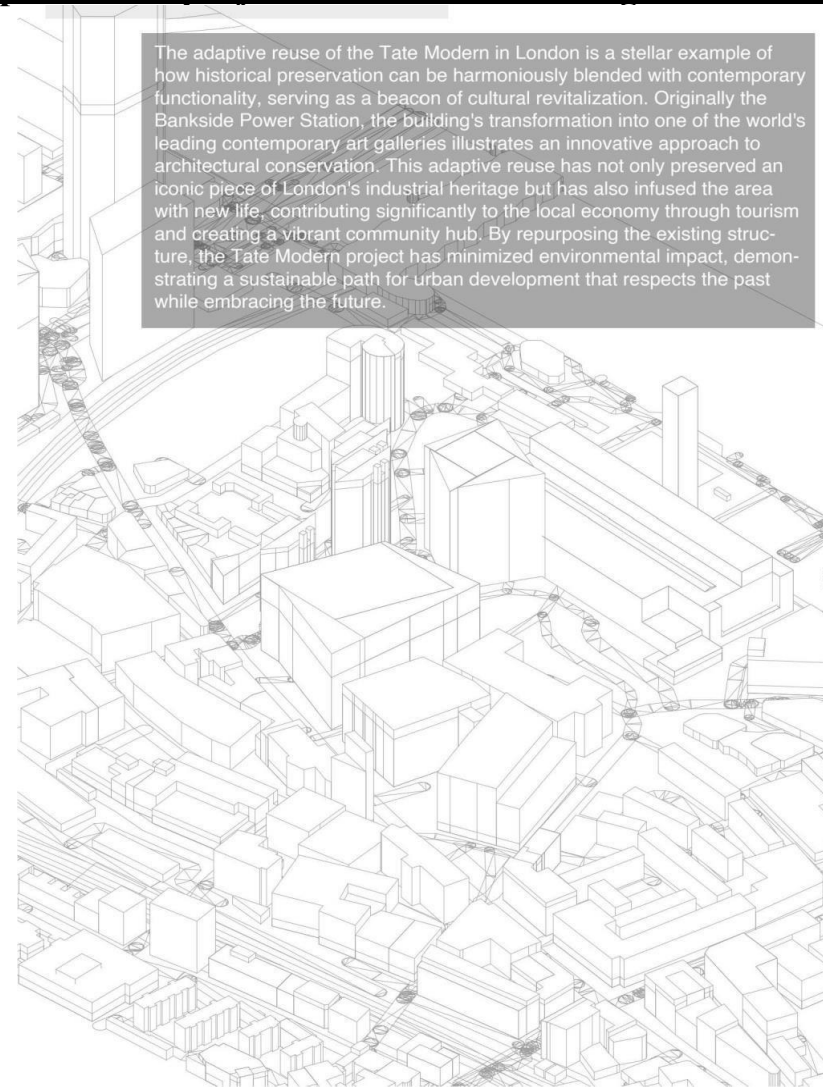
Tate Modern site plan. (Elaborated by author)
